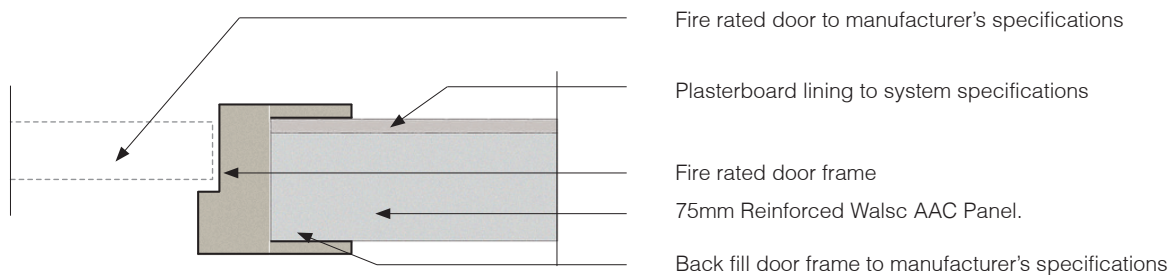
Service Shaft Wall Option 1 Fire Door Detail
